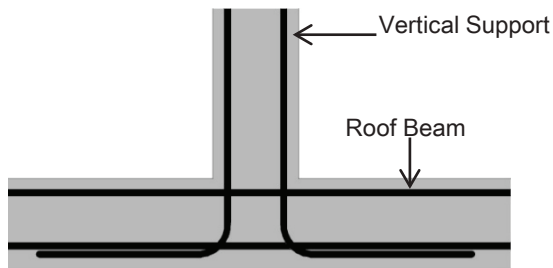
Arrangement of Beam Reinforcement Ending at Column
